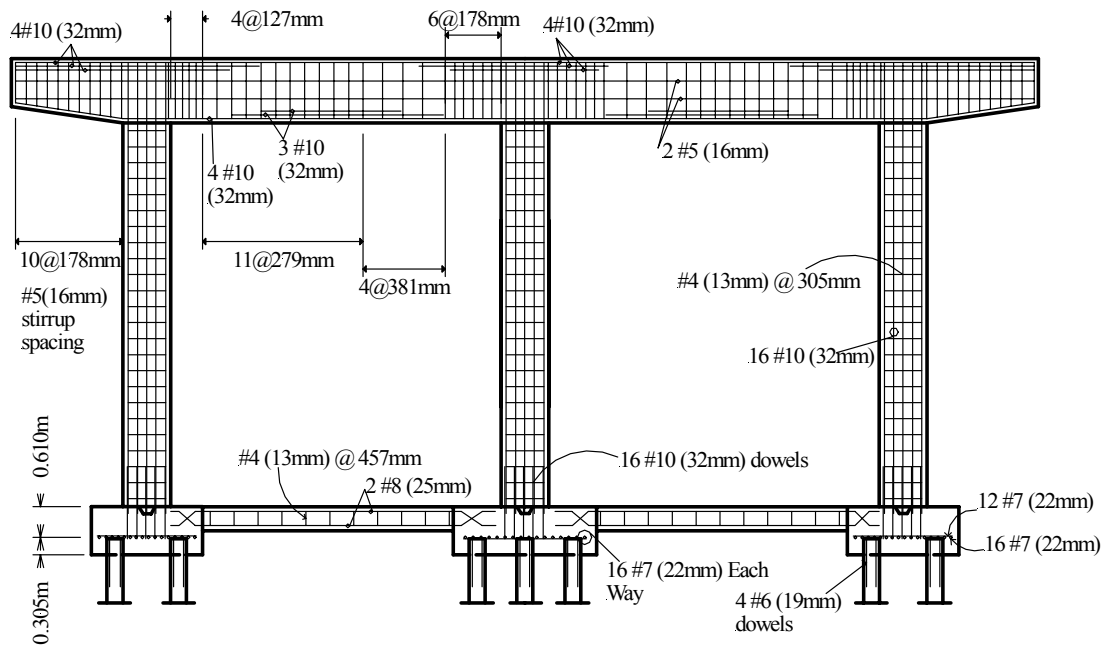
Steel reinforcement details for as-built Bent #5S (2000)
